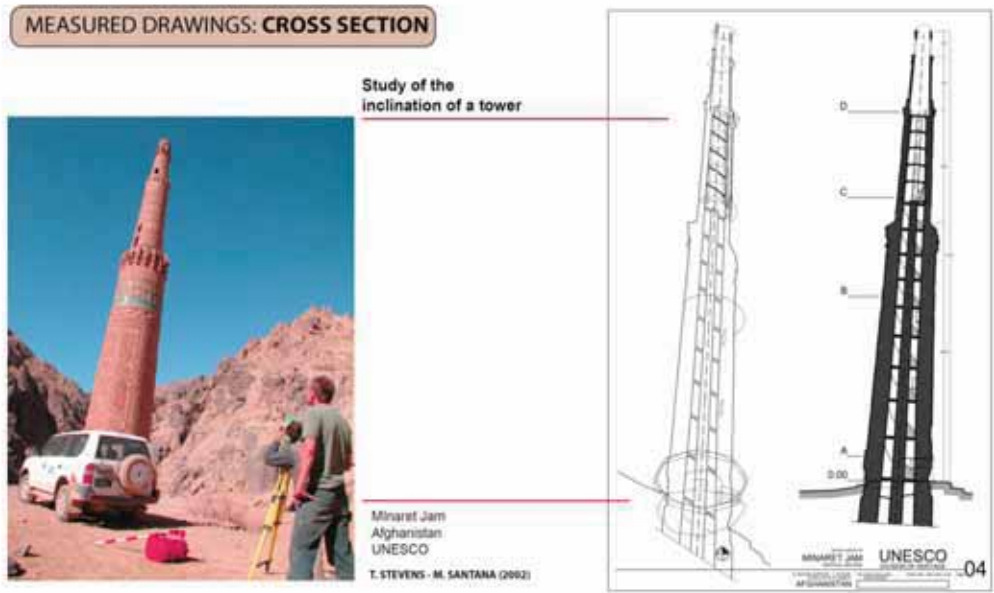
Inclination study using a cross section of Minaret Jam (Afghanistan).
